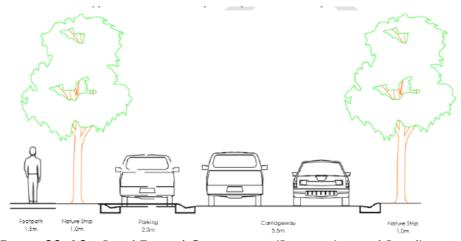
12m Road Typical Cross-section (Primary Internal Road)
